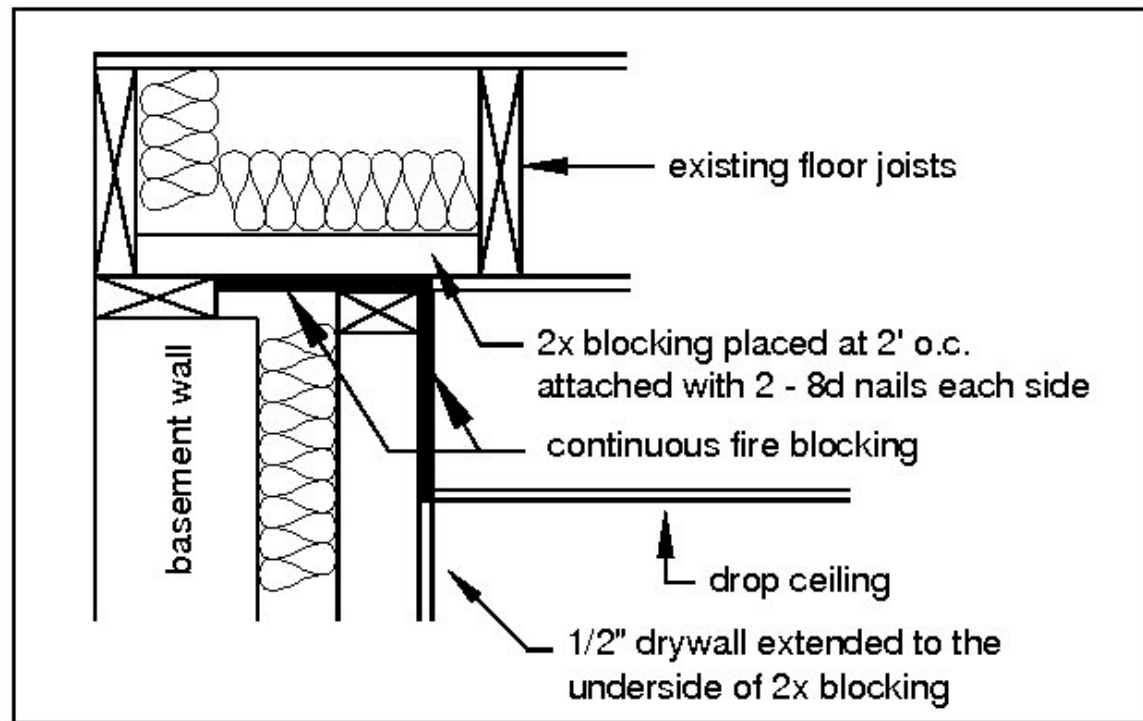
FIRE BLOCKING AT DROP CEILING
